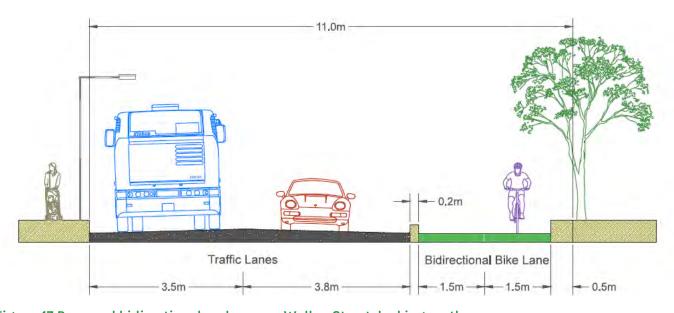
Proposed bidirectional cycleway on Walker Street, looking north.
